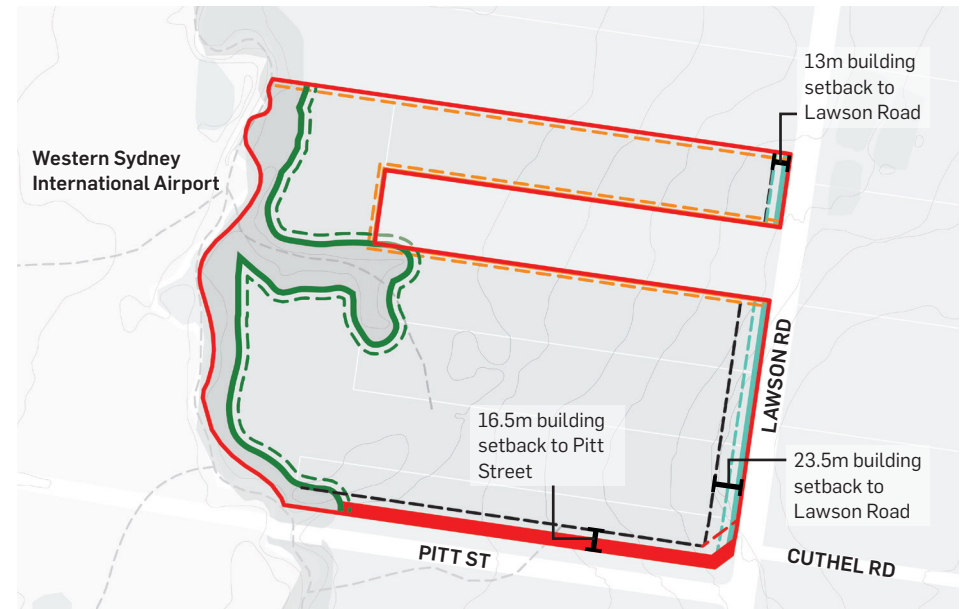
Proposed Concept Scheme - Building and Landscape Setbacks Plan
